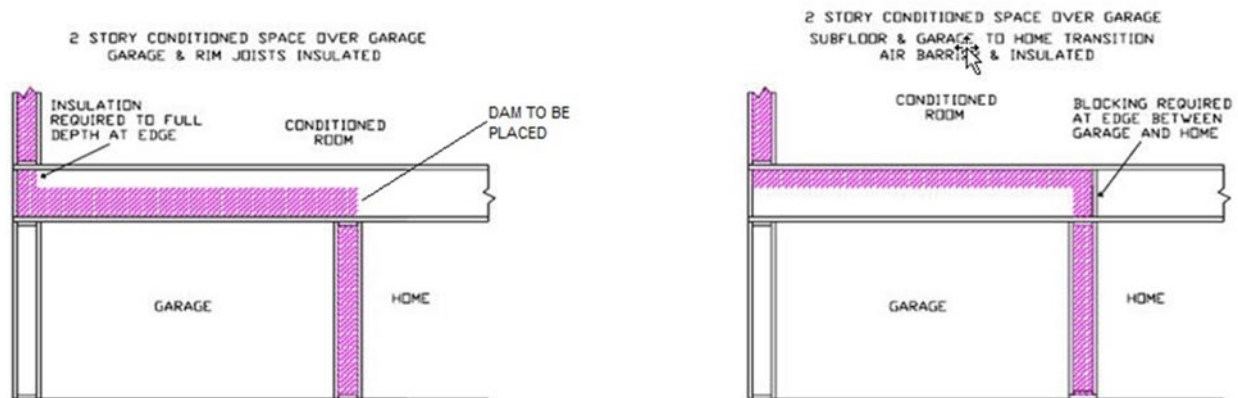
Homes with Conditioned Space Over Garage – Batt and Blanket Insulation
